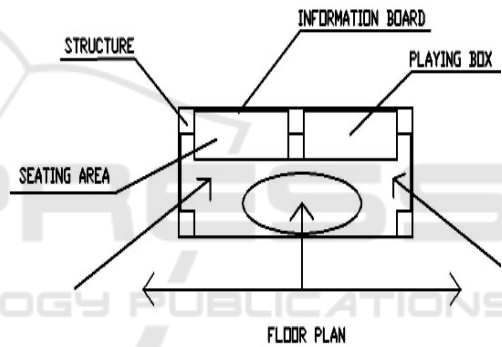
Alternative floor plan concept for child pedestrian shelter.
